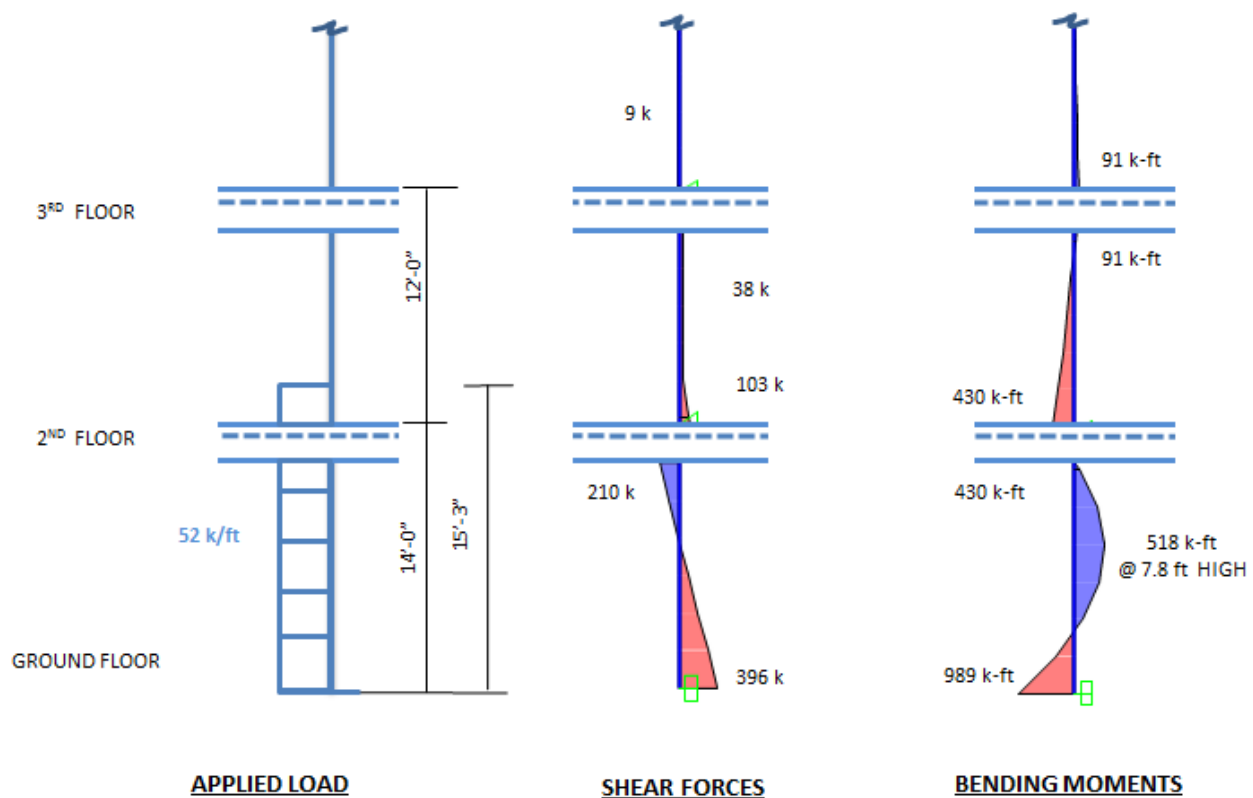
Hydrodynamic loading on exterior column of the Waikiki office building due to Load Case 2
